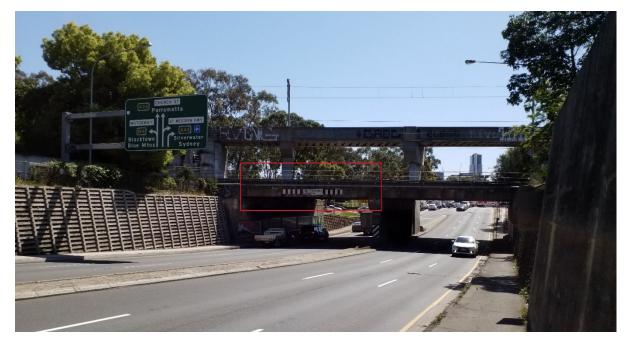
View north along Woodville Road showing indicative placement of sign (red square - not to scale).
